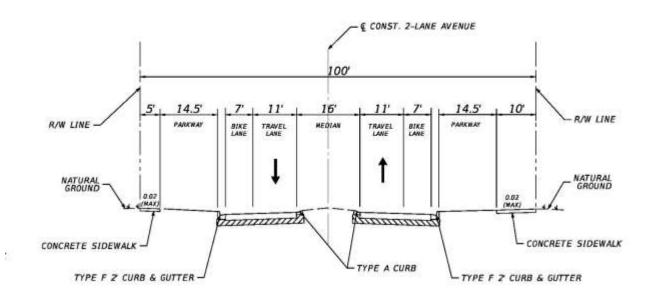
EXHIBIT F - BASELINE TYPICAL SECTION 2-LANE DIVIDED LOCAL ROAD
